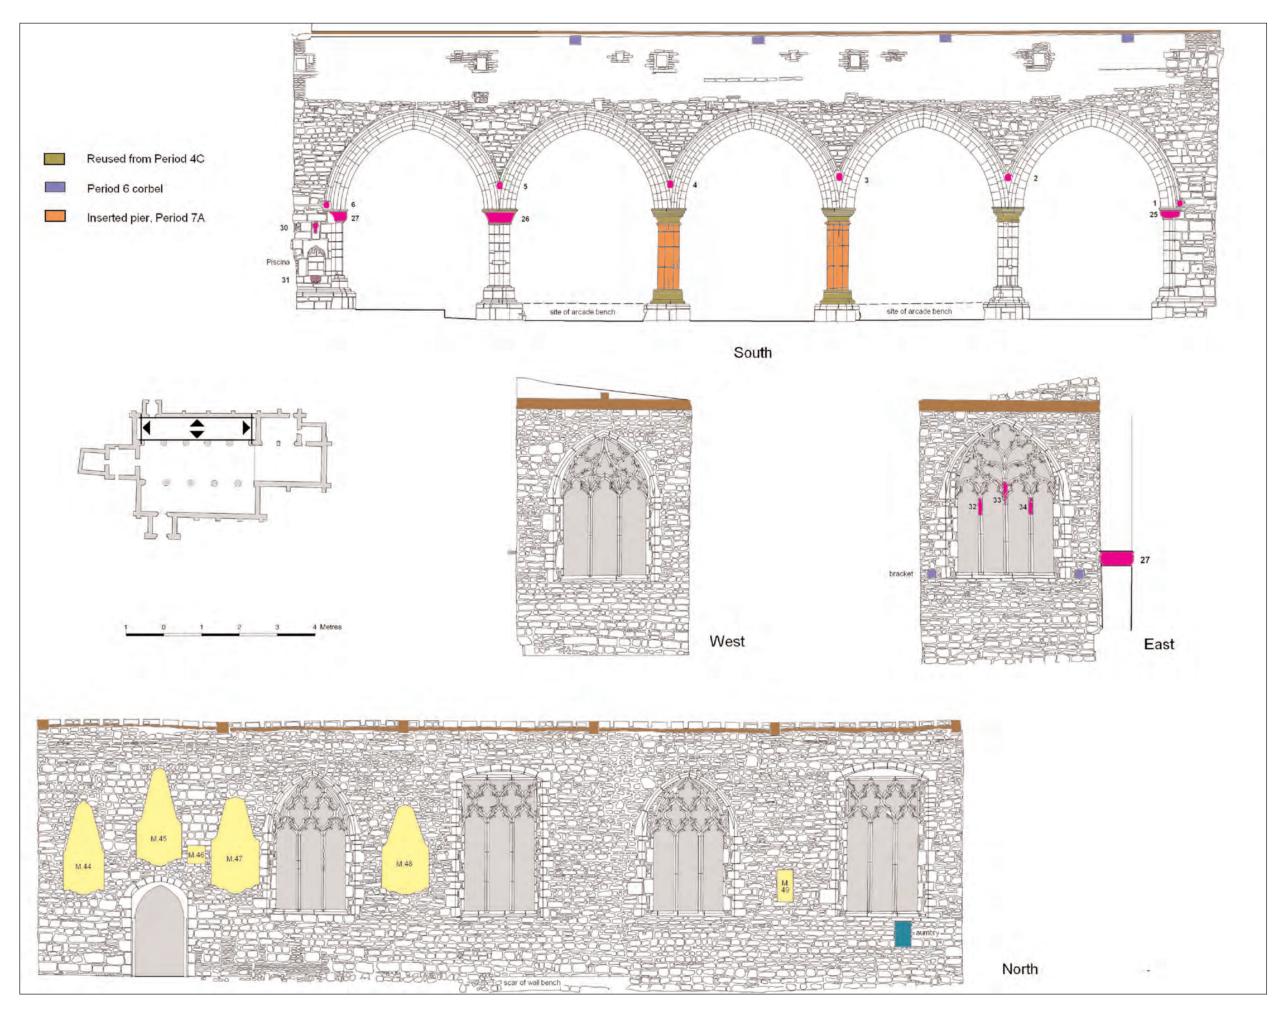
North aisle and arcade. Internal elevations, 1984. The positions of wall-mounted memorials are also shown (M.44–M.49). Scale 1:100. Drawing: Simon Hayfield
